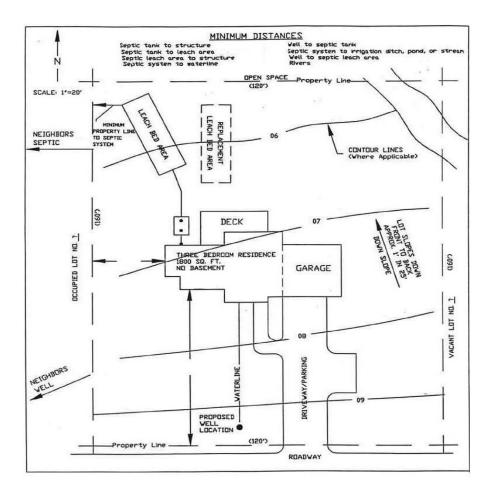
Typical Site Plan for Sealed Septic Tank and SWIS (dimensions to be provided by Applicant)
